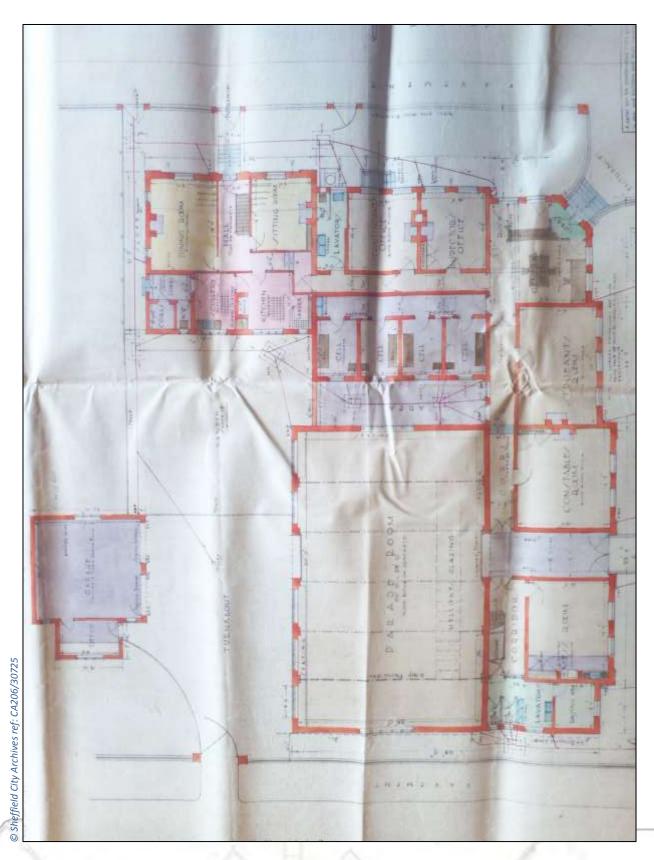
Ground floor plan for Hammerton Road Police Station, Sheffield, 1926.
